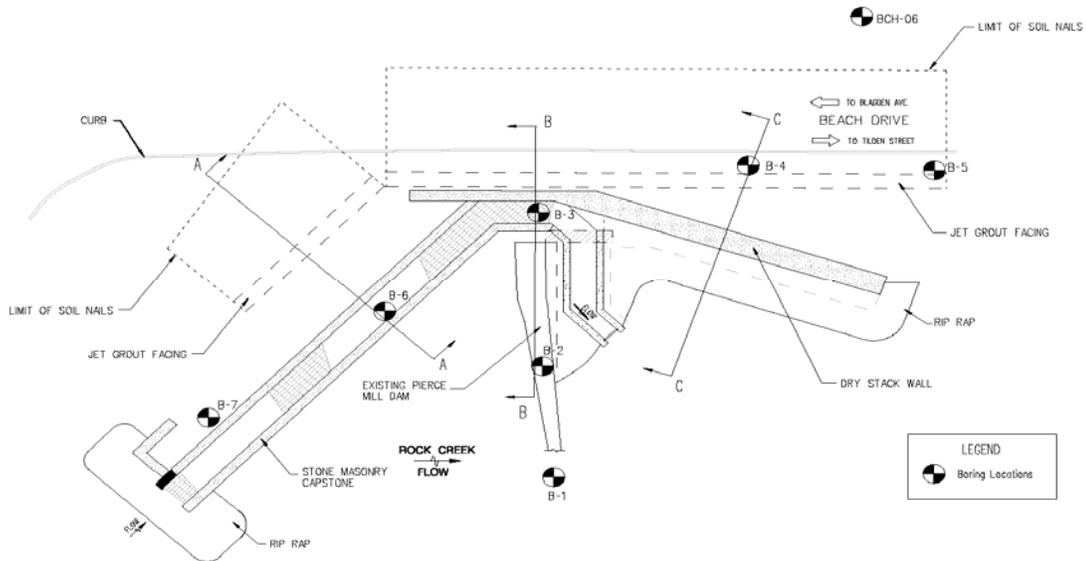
Site Plan Showing Boring Locations and Conceptual Soil Nail Arrangement (KCI 2003)
